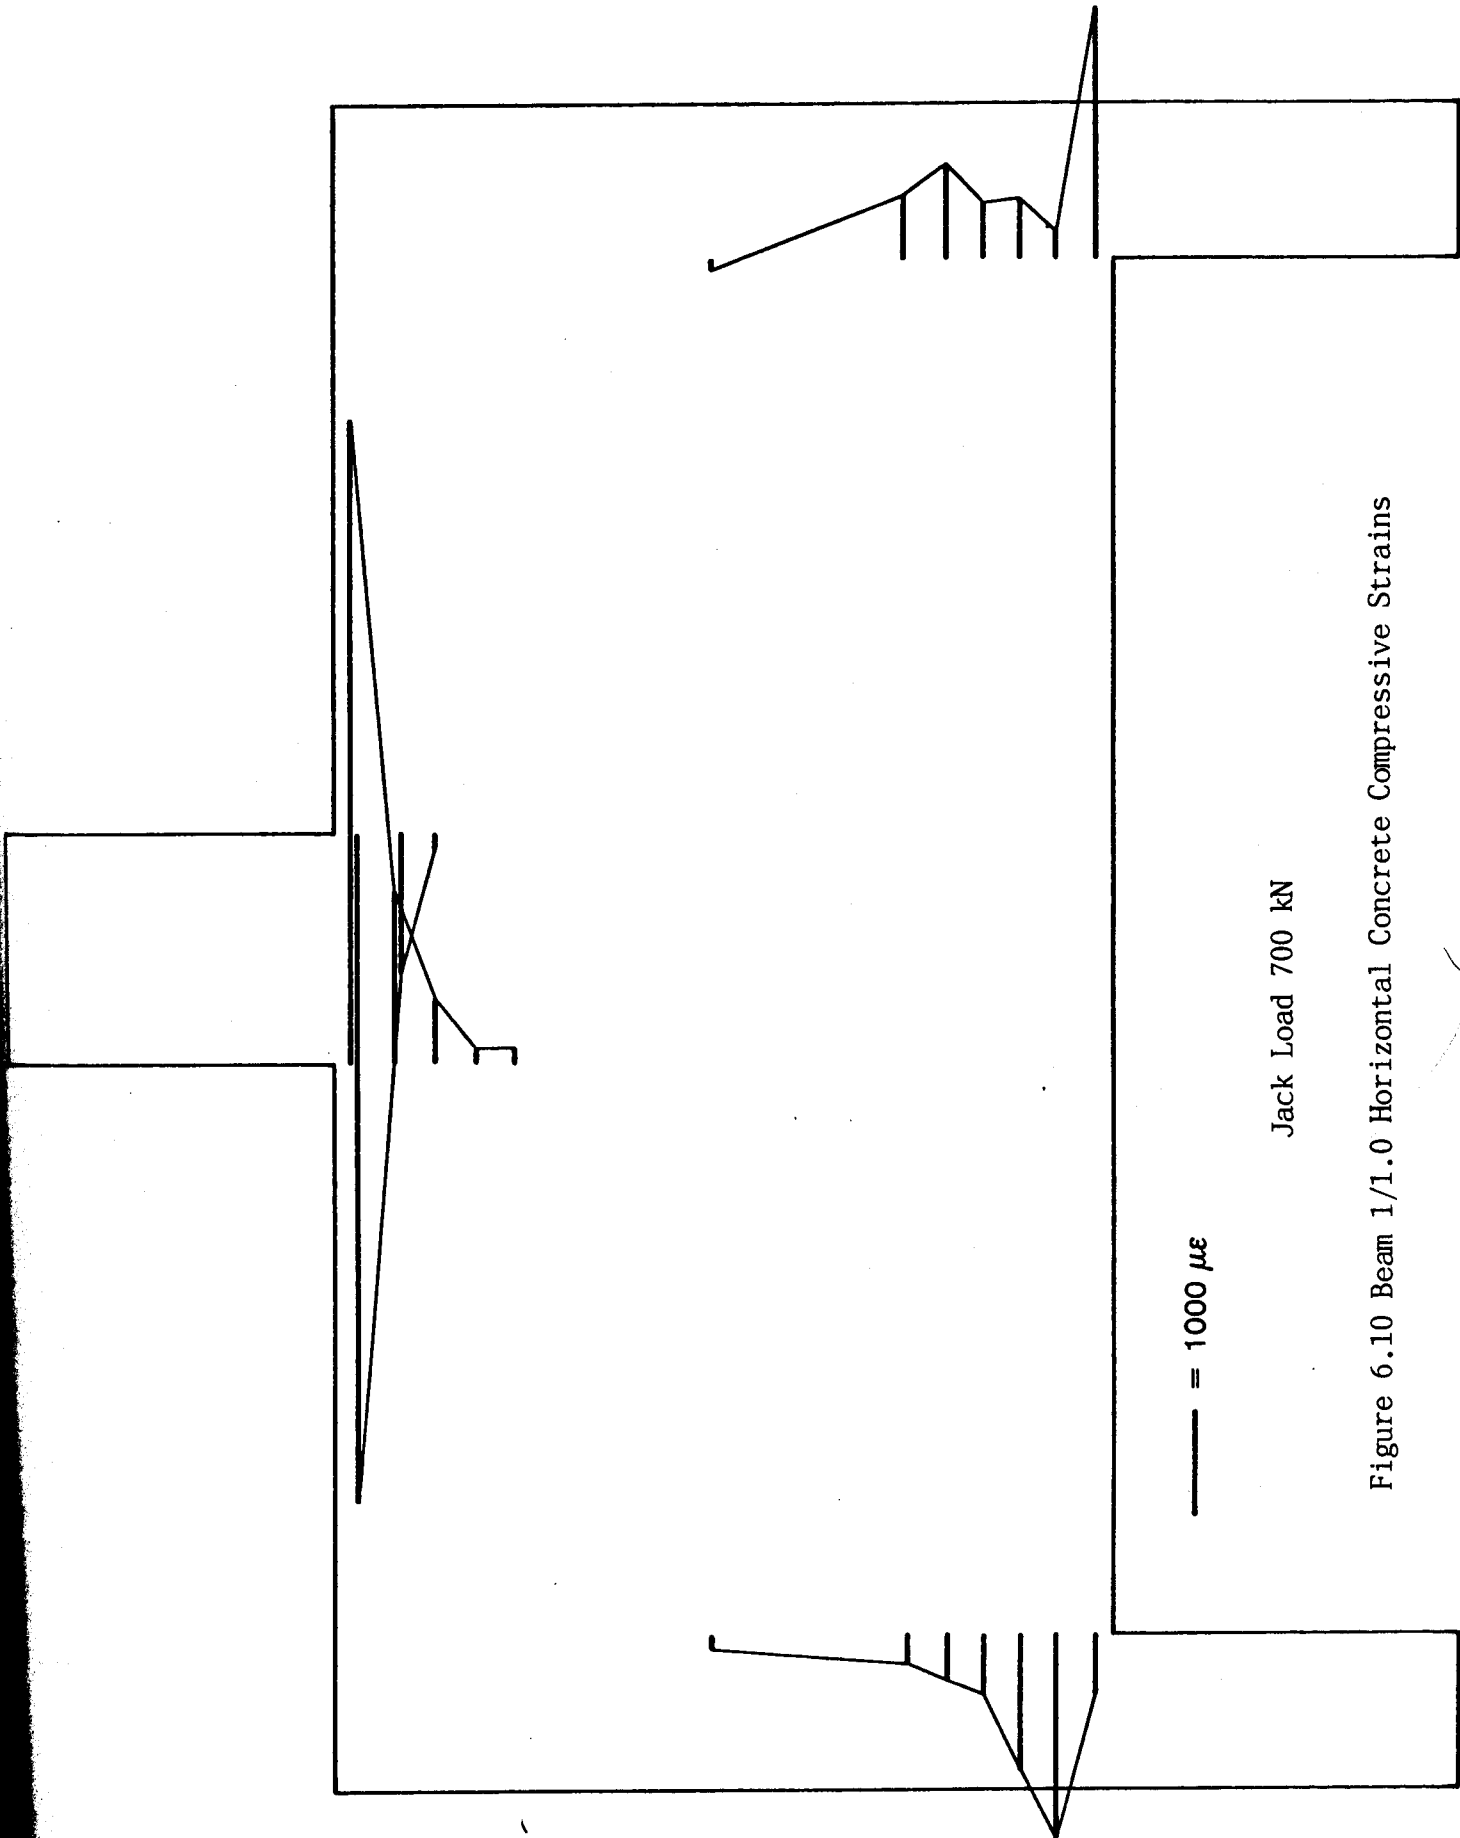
Beam 1/1.0 Horizontal Concrete Compressive Strains
